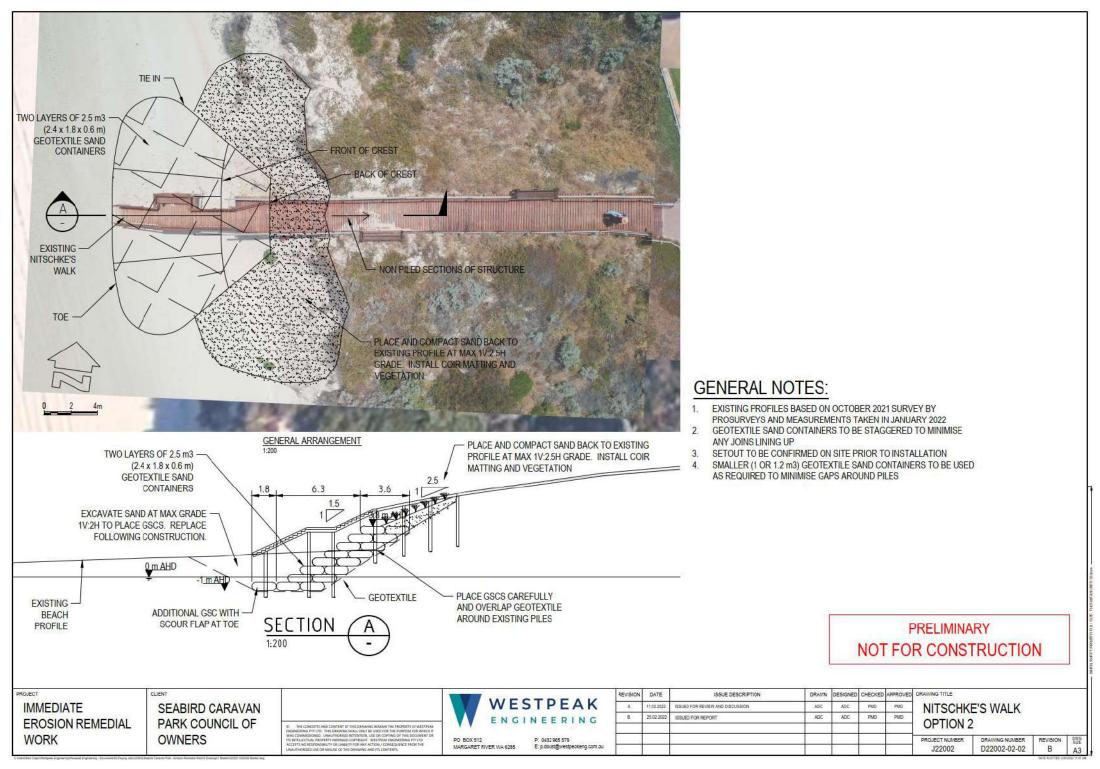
Nitschke's Walk Option 2 – Geotextile Sand Containers & Sand Fill
